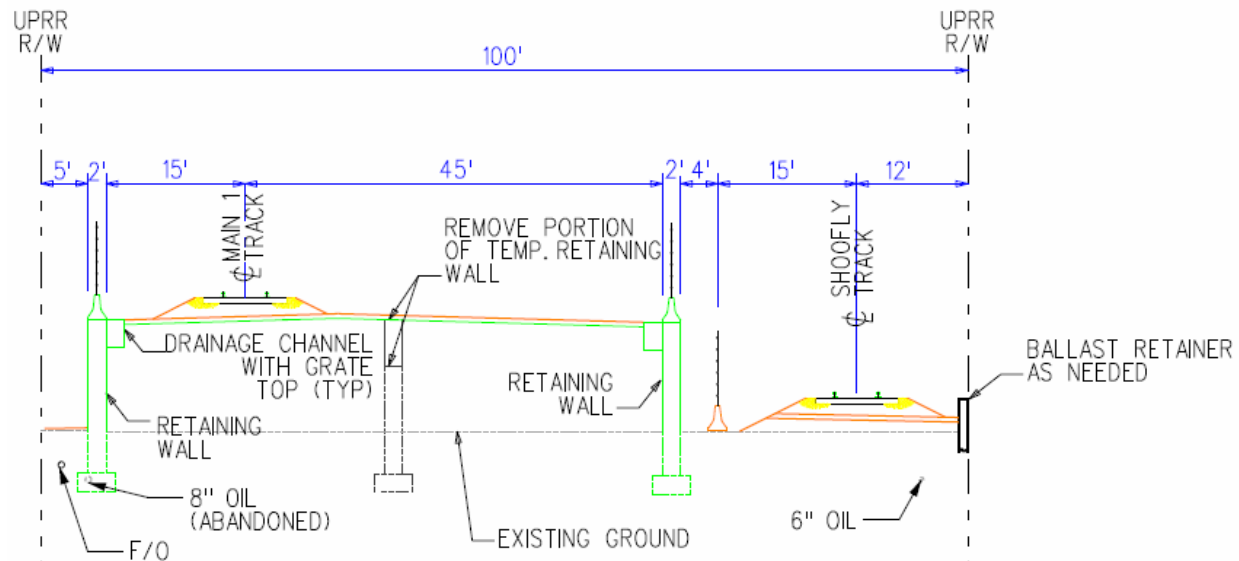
Move traffic to Track I on structure and remove shoofly to construct southern wall
